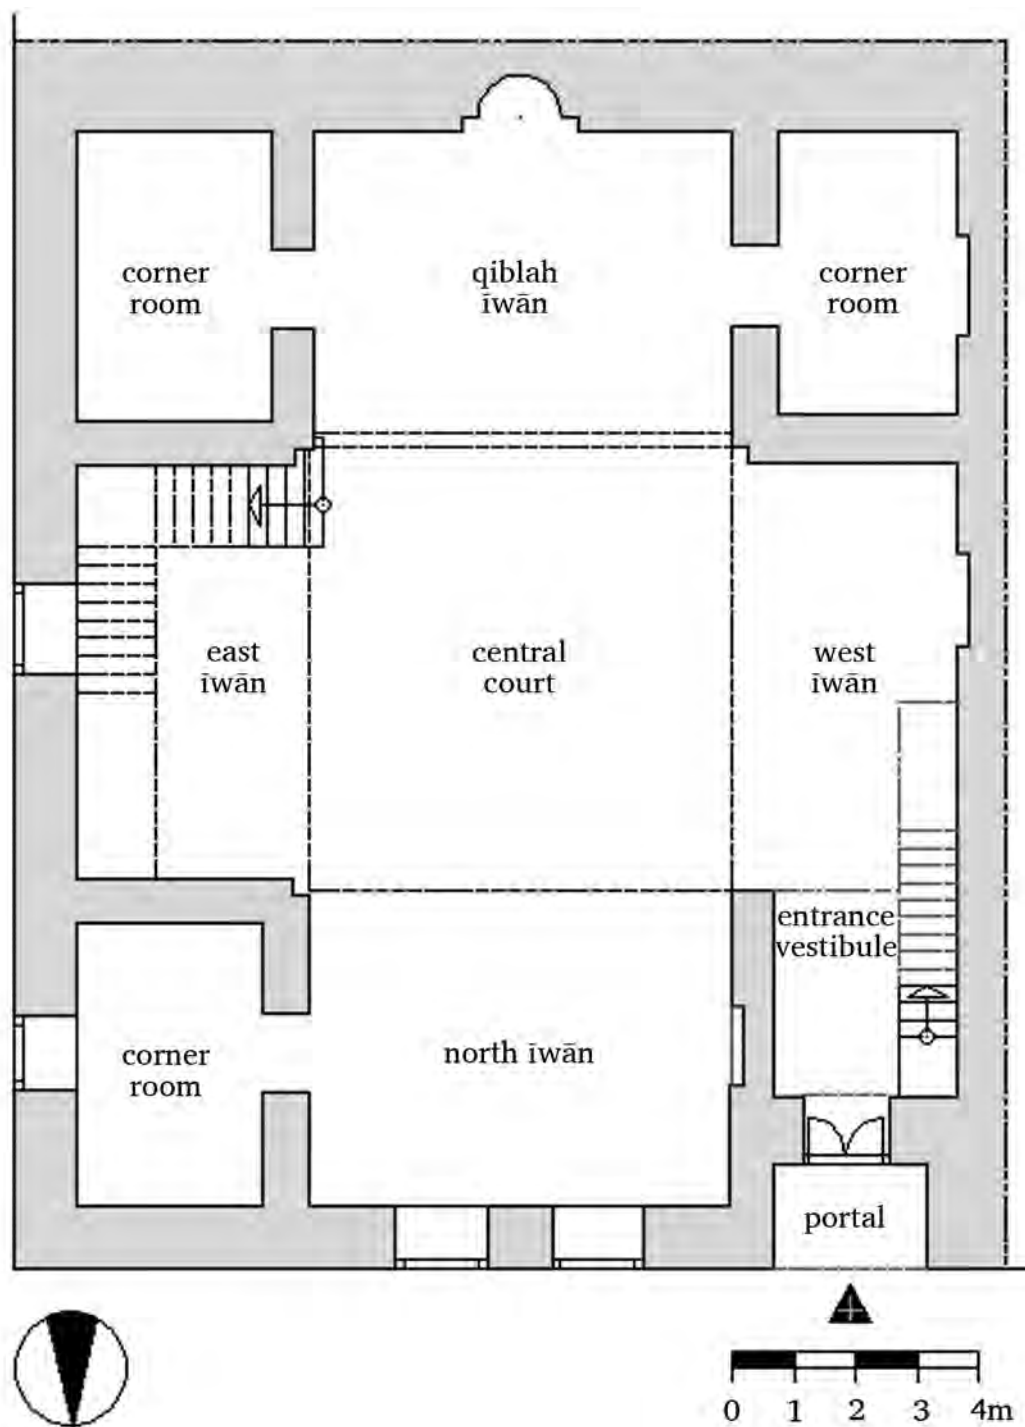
Damascus, Tankizīyah: floor plan (S. Poschmann)
